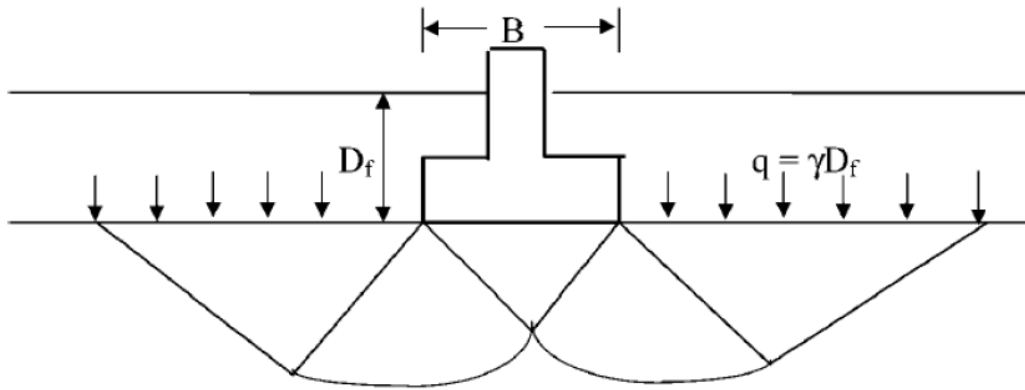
Mechanism of failure for soil under a rigid continuous foundation subjected to central vertical load (Terzaghi, 1943)
